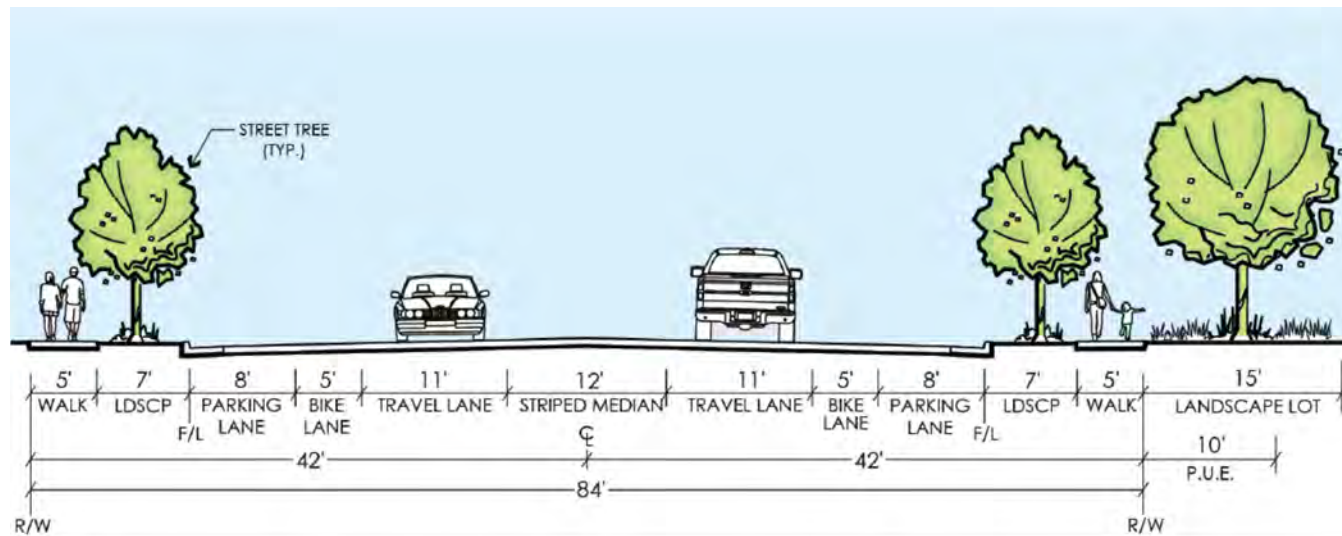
E. REDWOOD ROAD (WEST OF MOFFETT ROAD)
